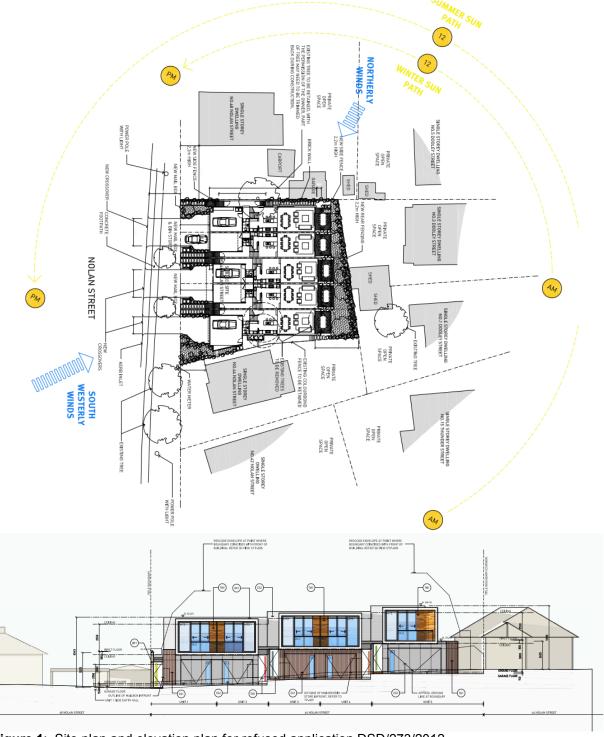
Site plan and elevation plan for refused application DSD/273/2012
